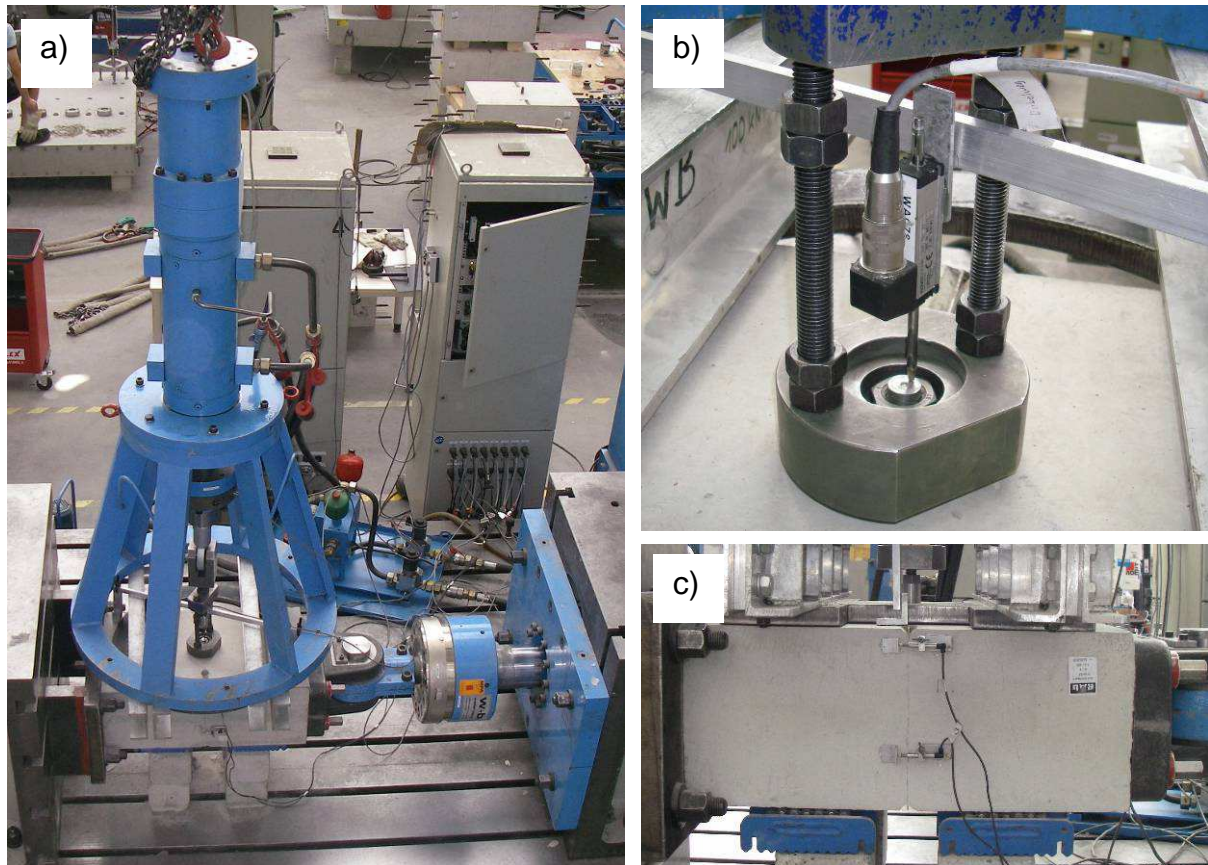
Test setup: a) Overview; b) Detail of transducer measuring anchor displacement; c) Detail of transducers measuring crack width
